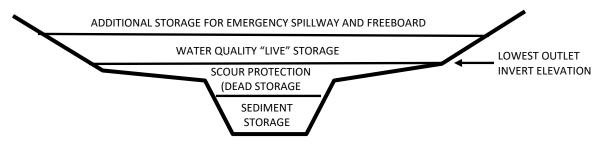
Cross-section of pond showing water quality storage portion of storage, along with other pond storage components.
